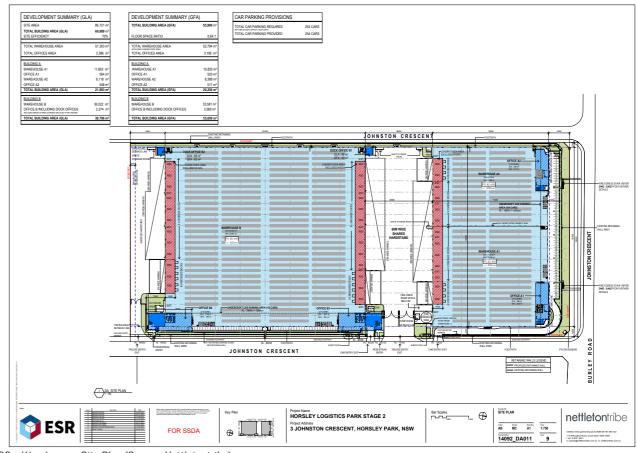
Warehouse - Site Plan (Source: Nettletontribe)
